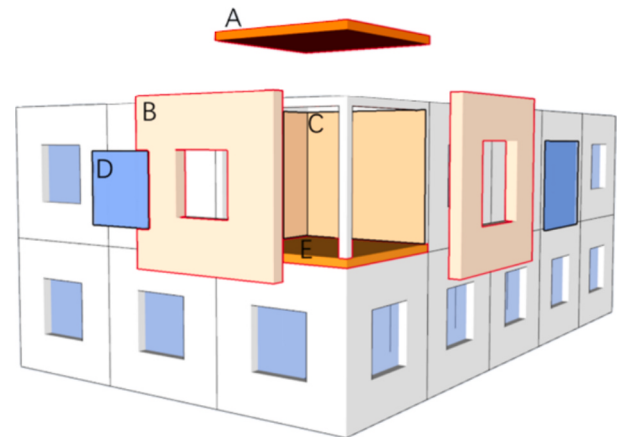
Envelope Component Classification (A: Roof; B: Exterior Wall; C: Interior Wall; D: Window; E: Floor Slab).
